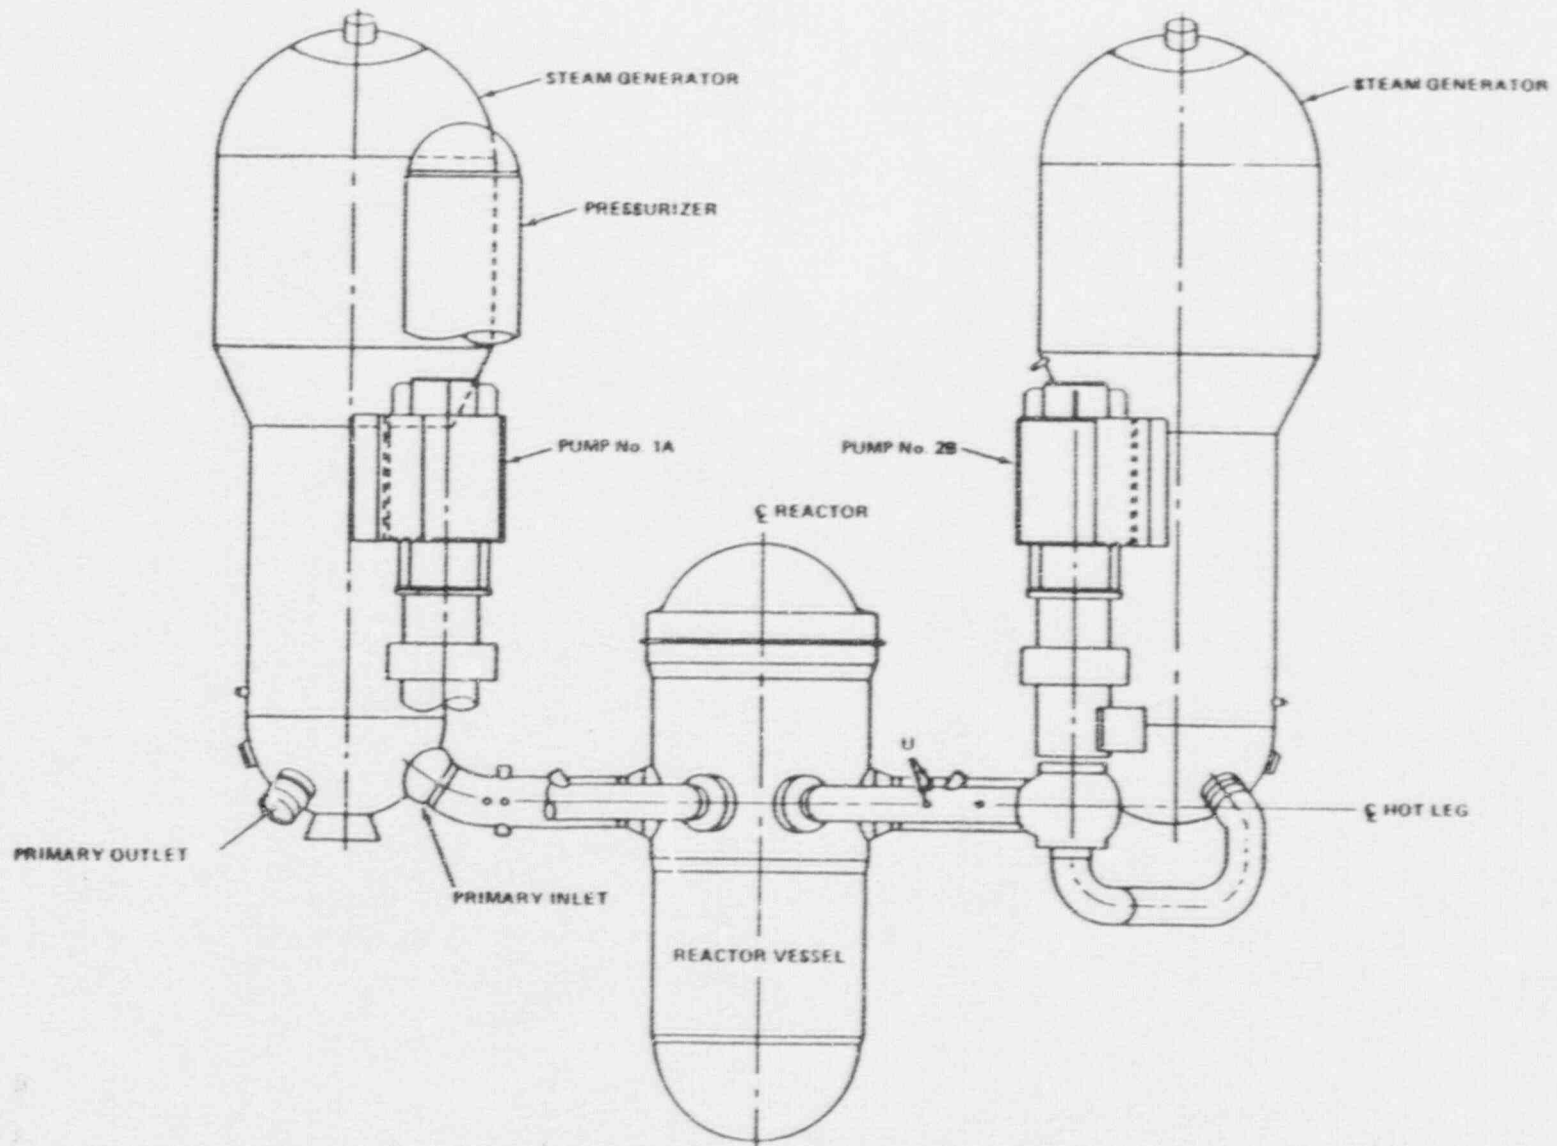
Elevation View of the RCS of a Typical Combustion Engineering Plant.
